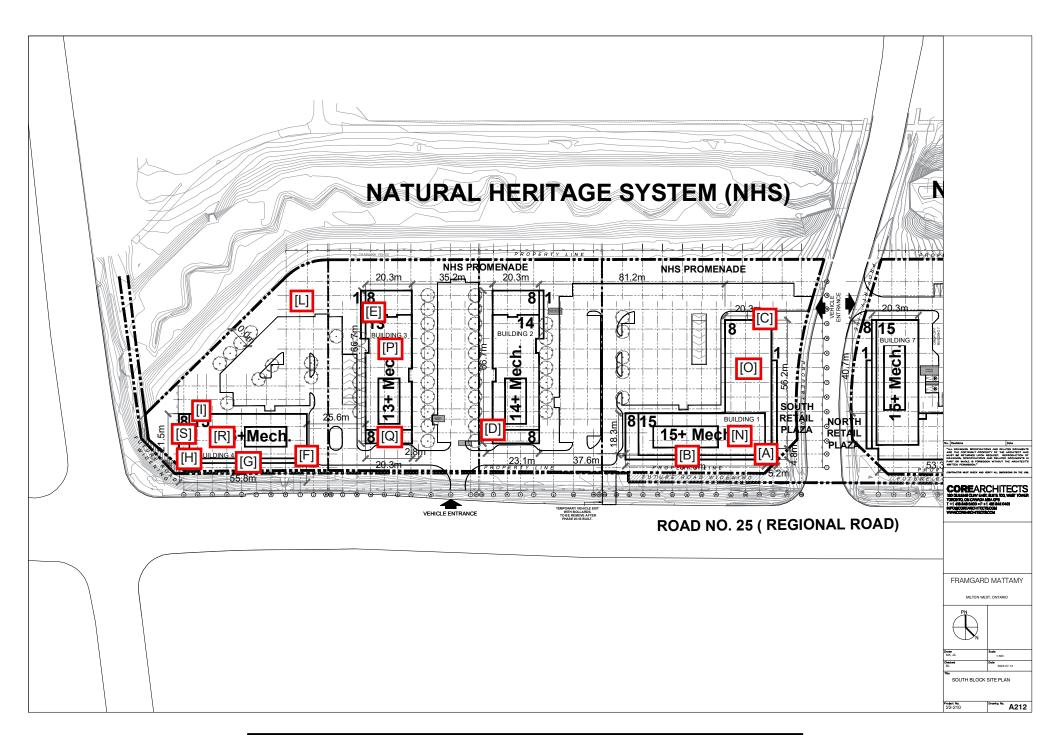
Proposed Site Plan Showing Prediction Locations, South Block
